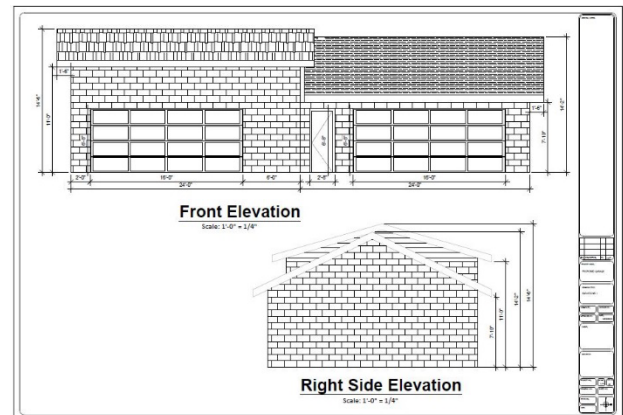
, by Applicant: showing proposed front and side elevations of the proposed garage addition. Note that existing garage is the smaller of the two sides, and hatching is not identifying materials correctly for the roof and siding.
